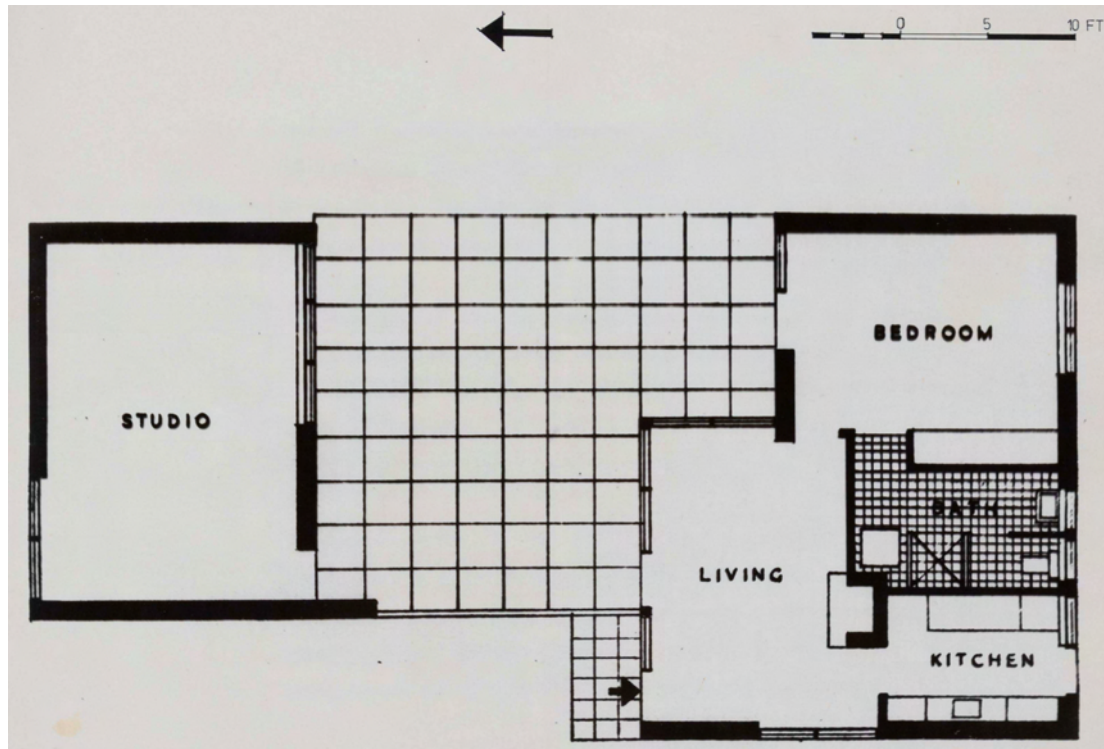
Plate XXXVI, Plan, Lavery House, Turramurra [sic], 1952. (Source: C. Boesen, 1979, *Sydney Ancher: A Profile*, Volume 1 p.155)
